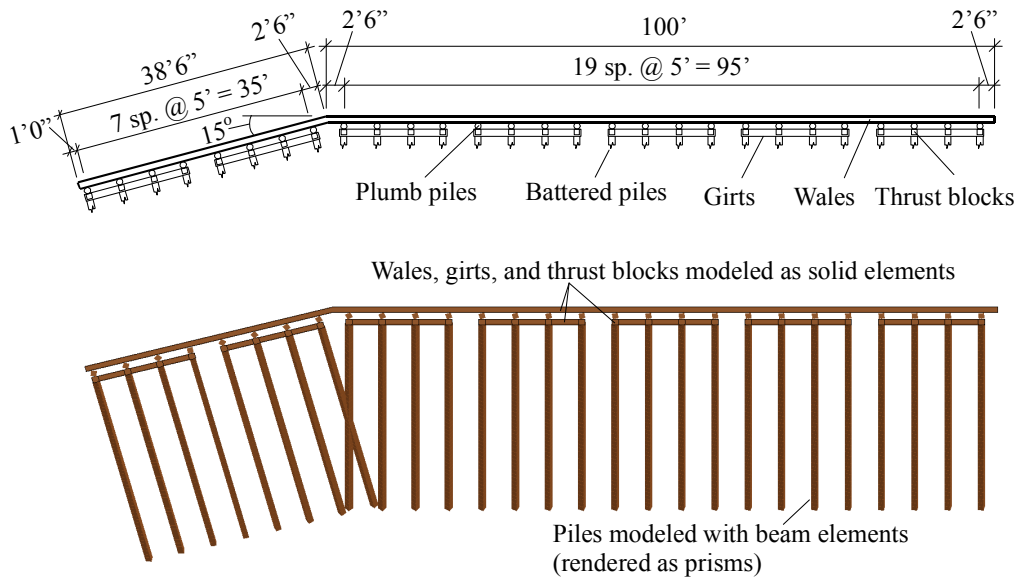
Plan view and geometry of flexible timber guide wall (schematic diagram and rendering of the corresponding finite element model)
